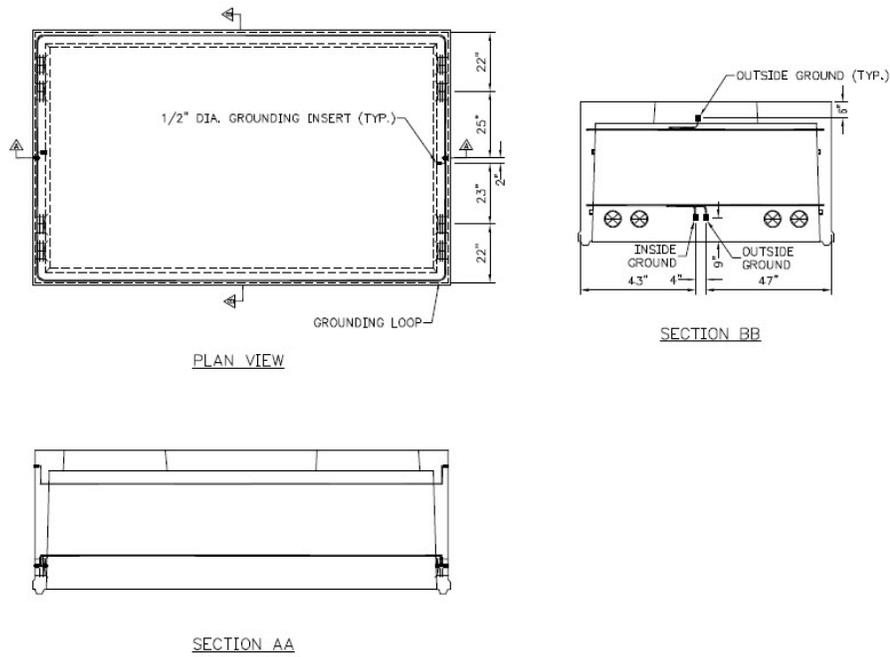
7' × 12' (94" × 155") Manhole Top Section Ground Grid
